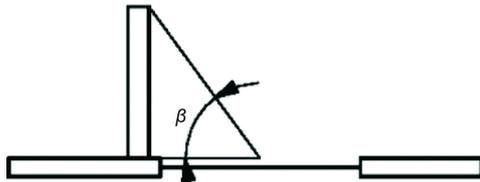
Shading of the window due to the existence of vertical elements on the façades (horizontal section)
